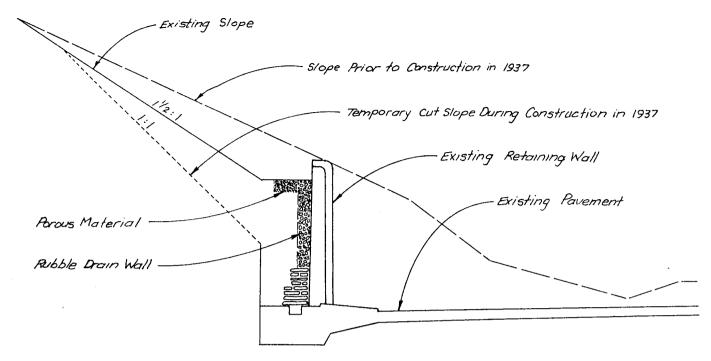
Typical pre- and post-construction (1937) topography along the Columbia Parkway retaining wall.
